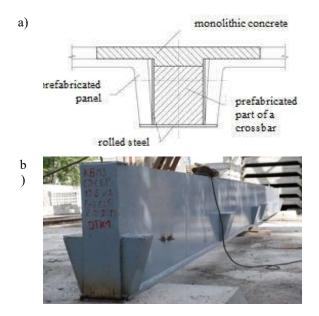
Prefabricated monolithic reinforced concrete crossbars:
